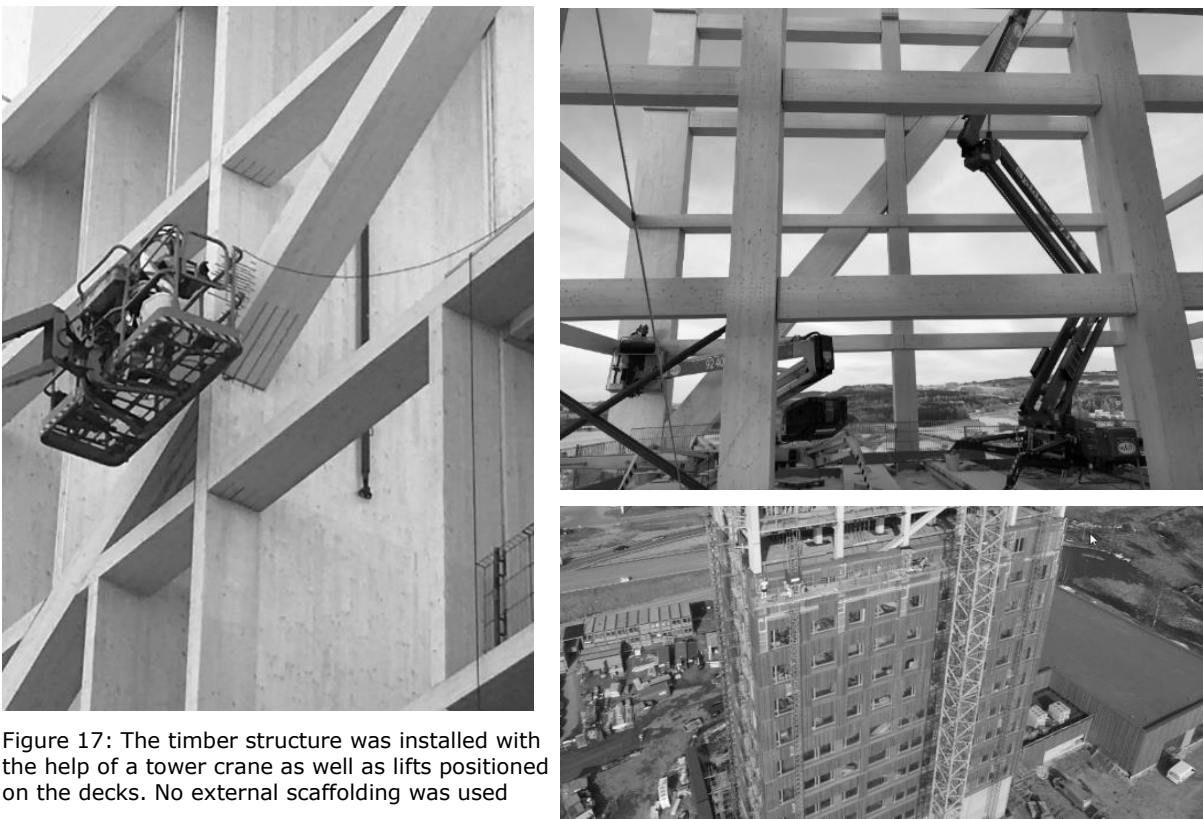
The timber structure was installed with the help of a tower crane as well as lifts positioned on the decks. No external scaffolding was used
